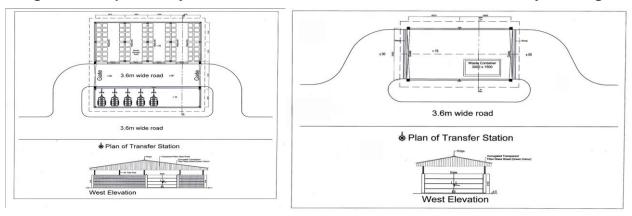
Proposed Layout Plan and location of five transfer stations in Mymensingh
